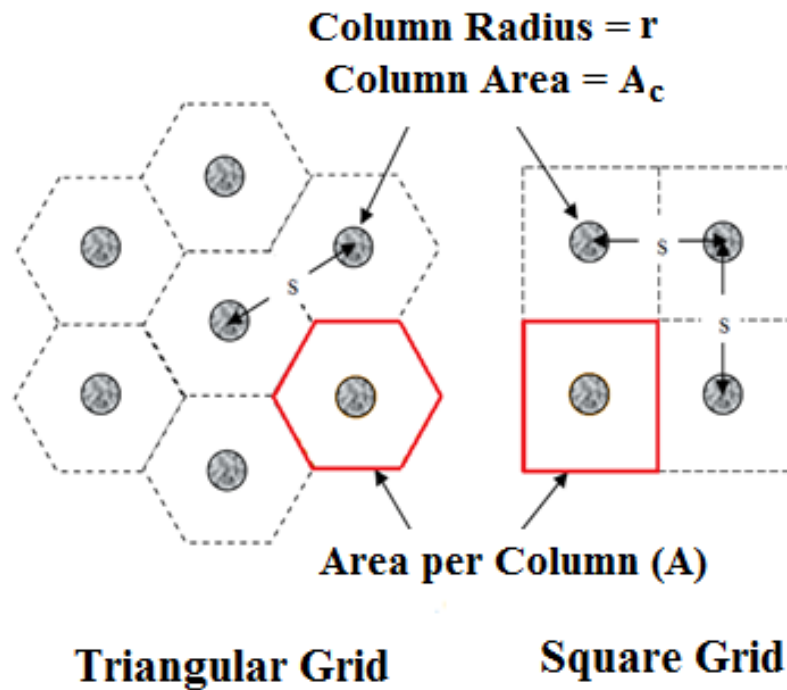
Typical arrangements of stone columns; adapted from (McCabe, 2007)
